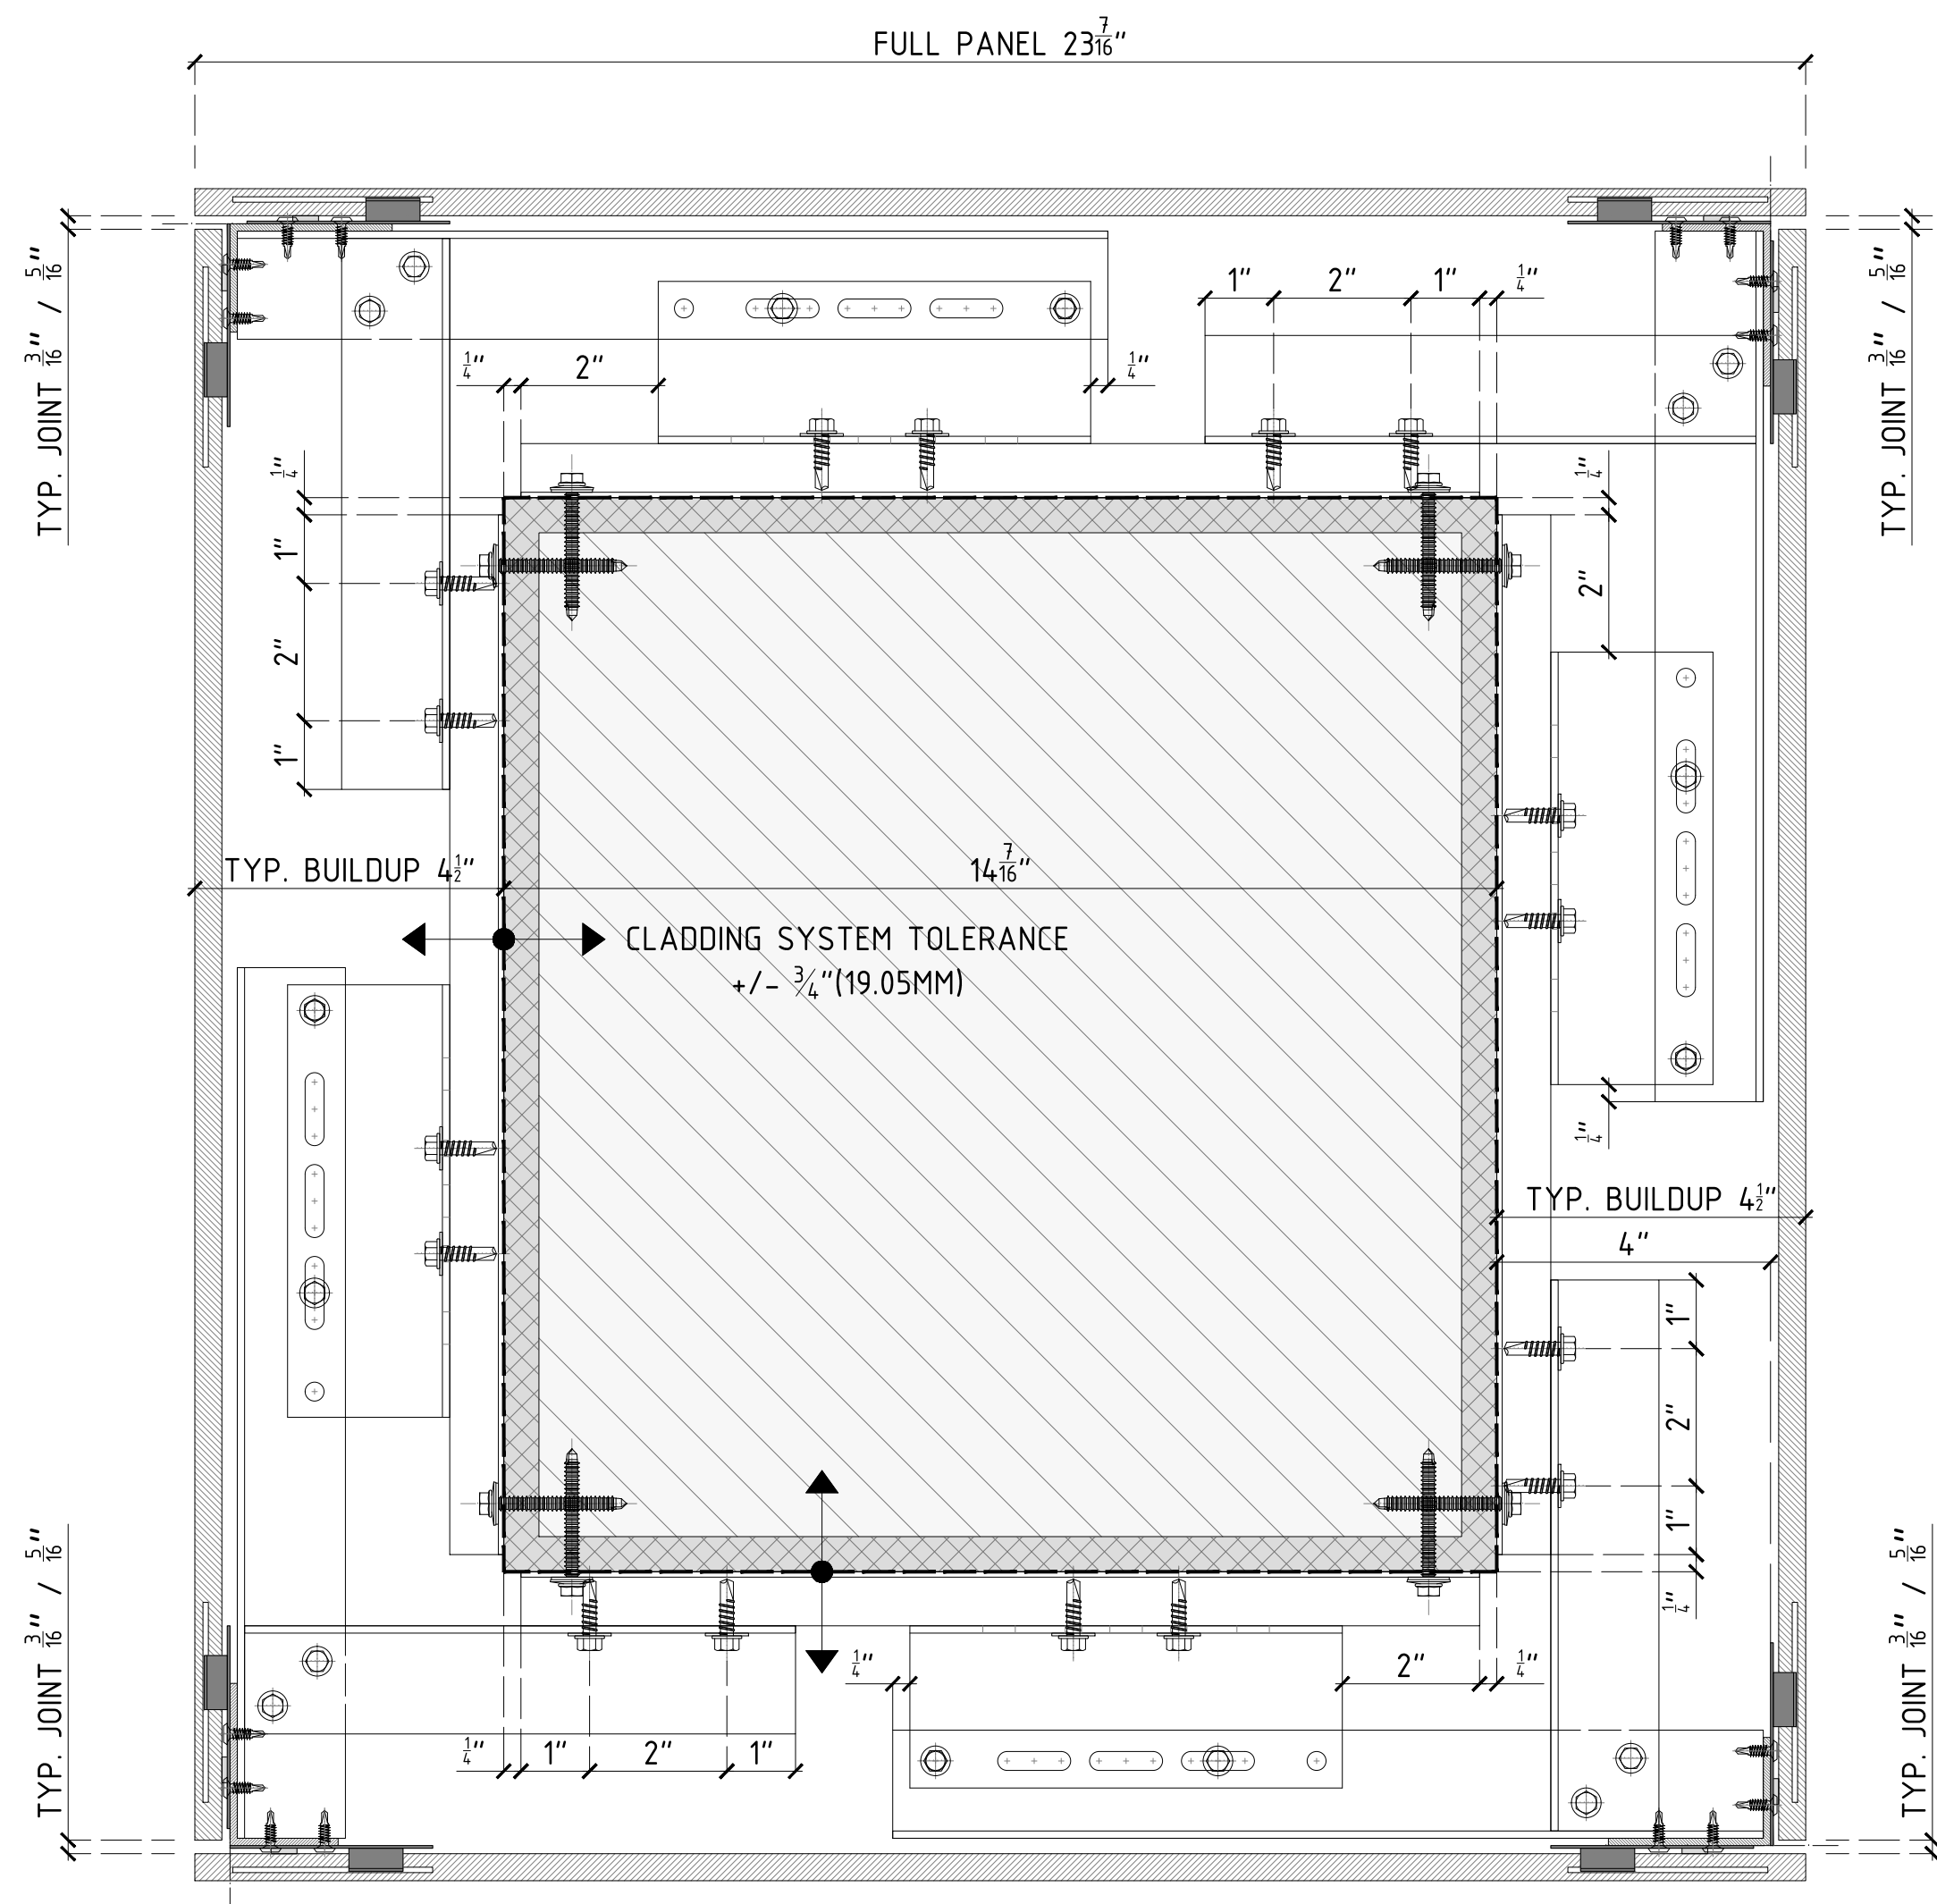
DETAIL A - TYP. PLAN DETAIL @ SYSTEM DEPTH VARIATION
